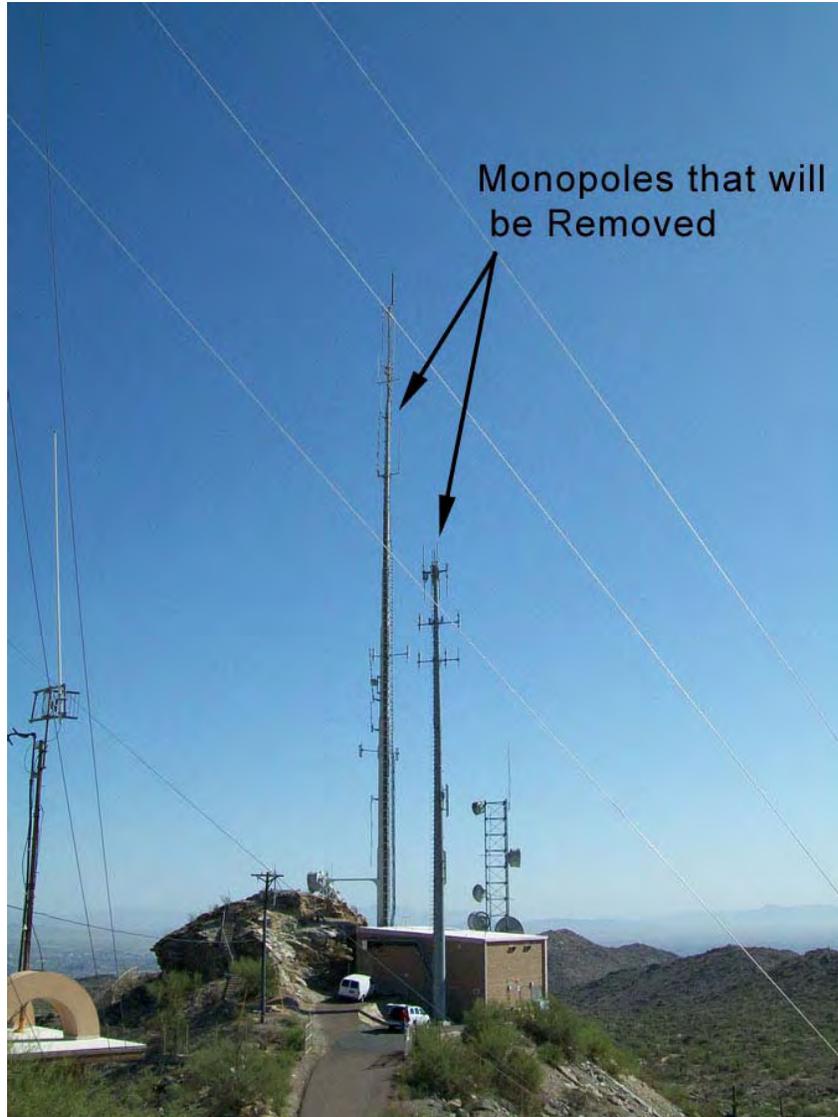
View from the Approximate Location for the Proposed Replacement Tower to the Southwest
